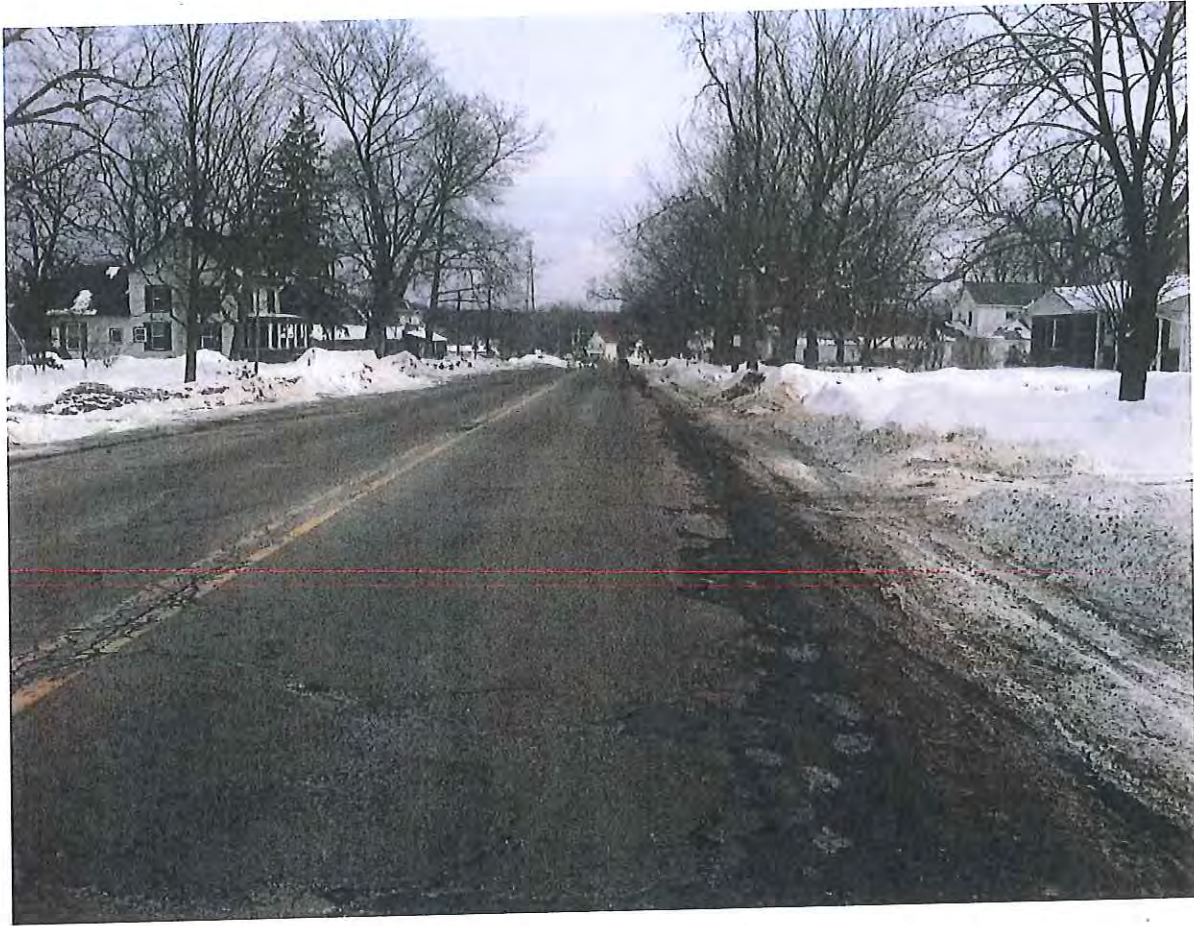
NB Central at 200' from Parking (Stopping Sight Distance)
